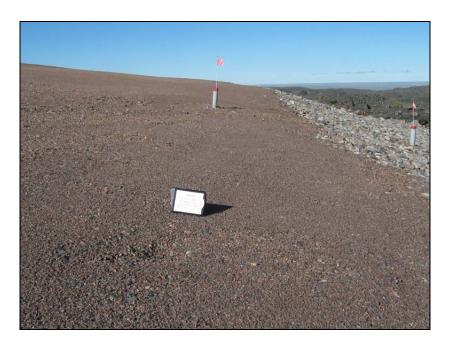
Facing north from the southeast corner of the rip-rap. ↑
